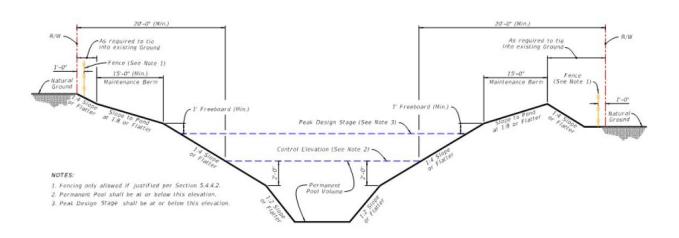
POND SIZING TYPICAL SECTION (NOT TO SCALE)
